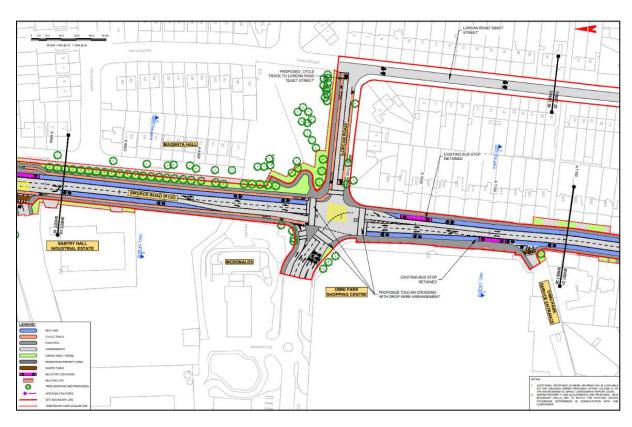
Extract from General Arrangement Drawing (Sheet 20)
